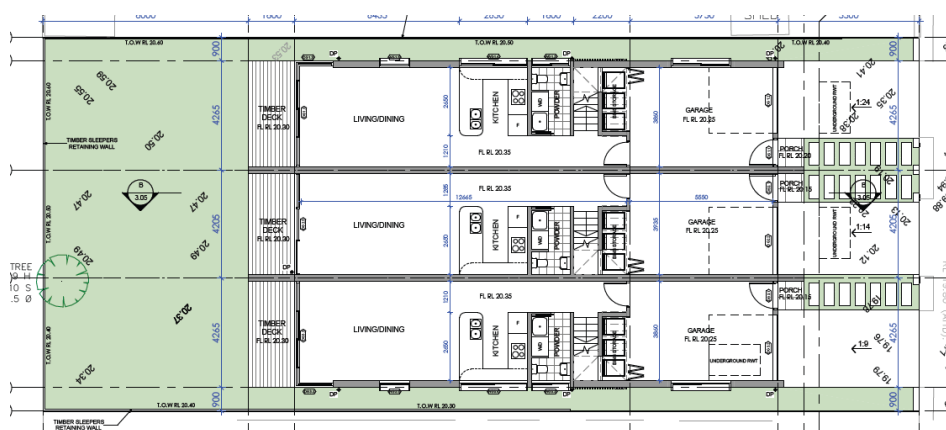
Initially proposed ground floor plan (Source: Bryan Long Group)
